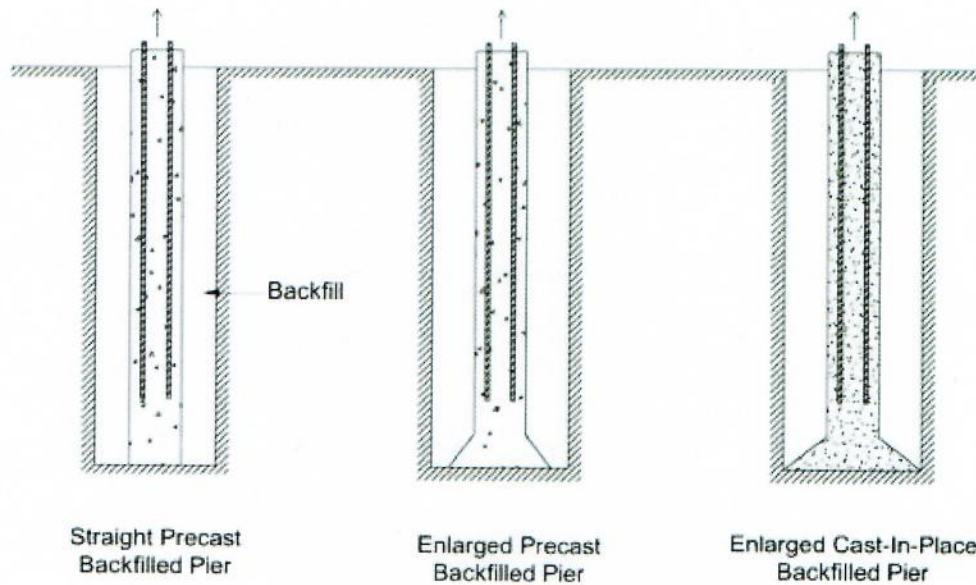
Alternative Construction of Shallow Over-Drilled and Cast-in-Place Pedestal Foundations.
